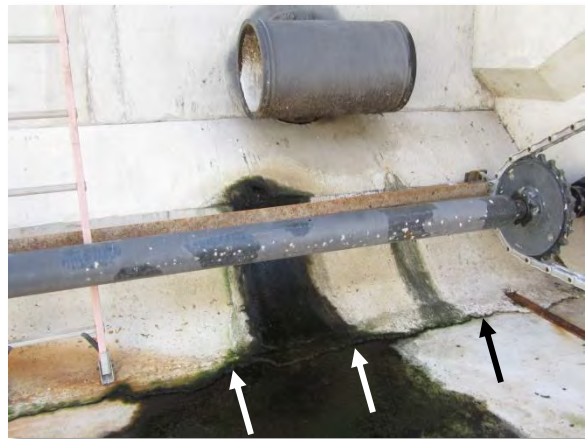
Broken or irregular concrete at toe of fill at east wall.
